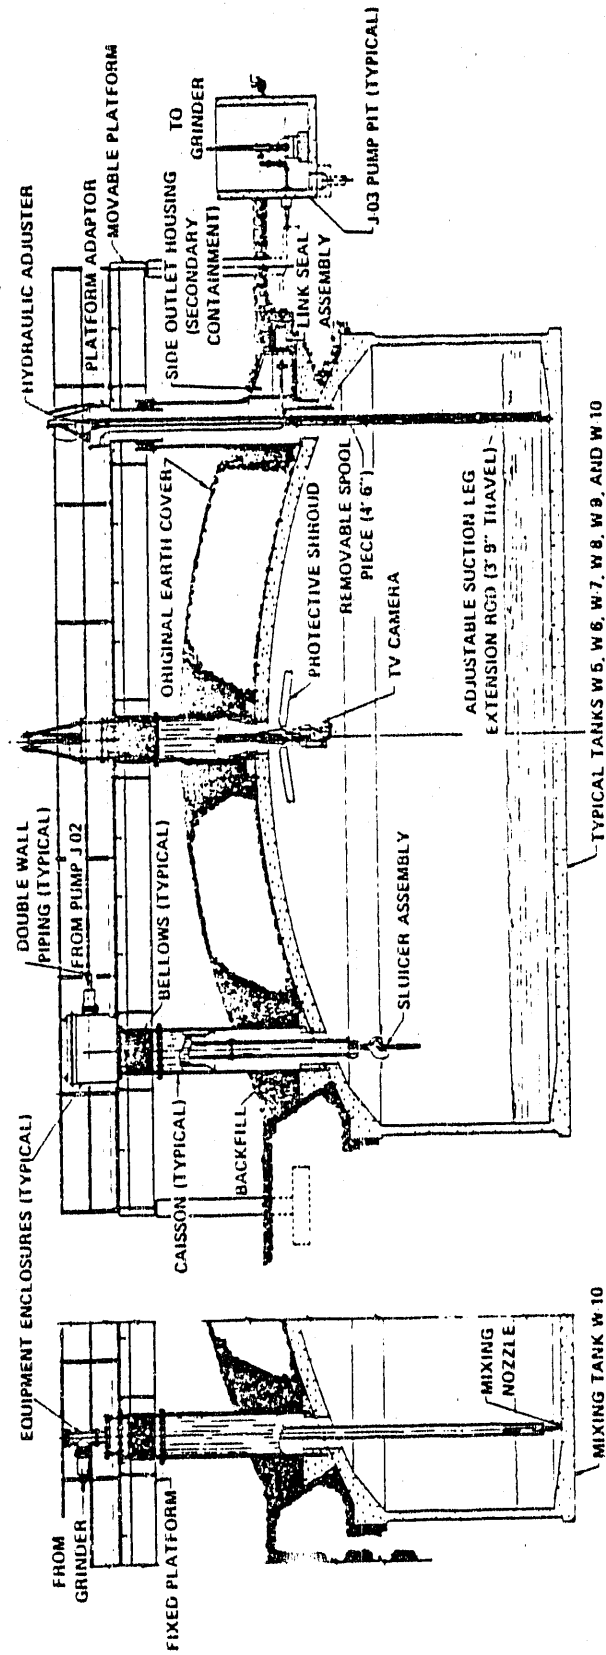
Schematic view of Guniting Tank construction showing sludge removal equipment.
